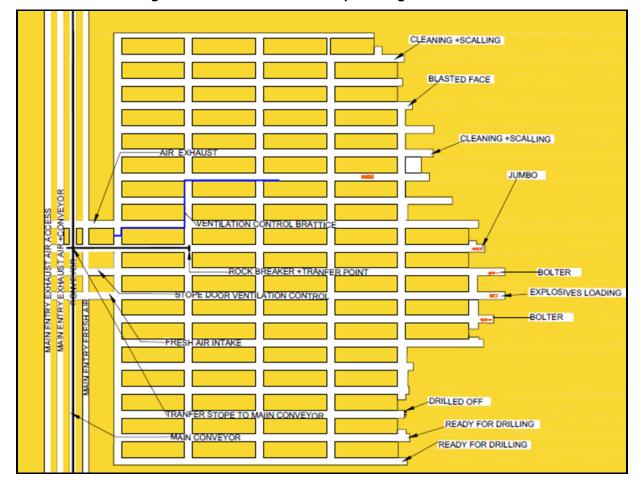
Room and Pillar Stope Configuration Phase 1
